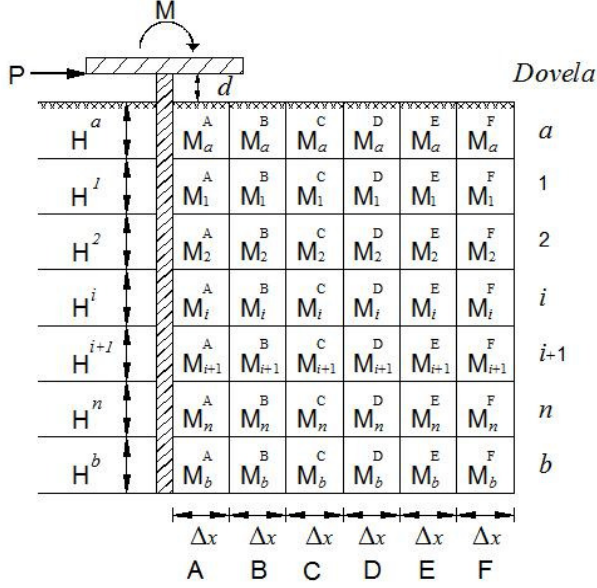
Pier or pile of foundation submitted to a lateral load and moment
